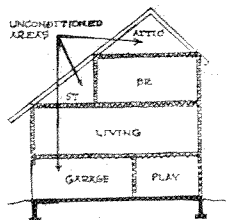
Enough insulation should be used between conditioned and unconditioned areas.
